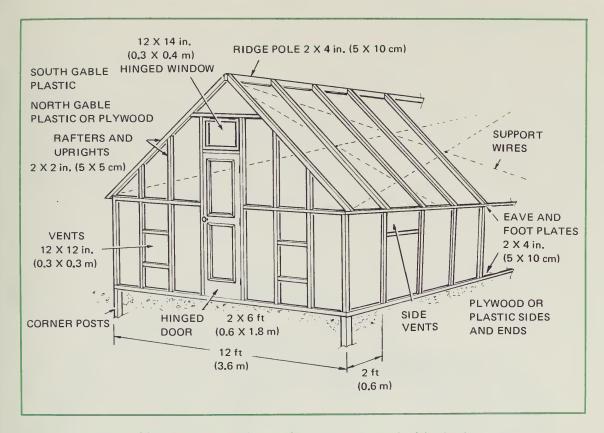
One type of homemade greenhouse that can be covered with plastic.
